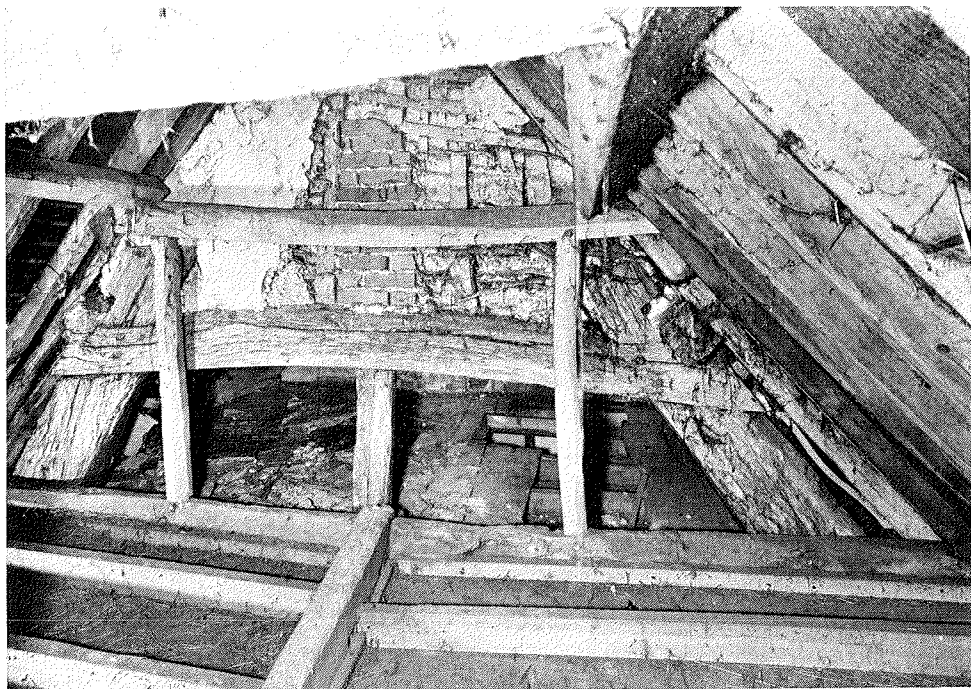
PLATE IIIb. Cruck structure of main roof space, looking S from roof of extension and showing original end wall and top of cruck blades in truss a-a'.
